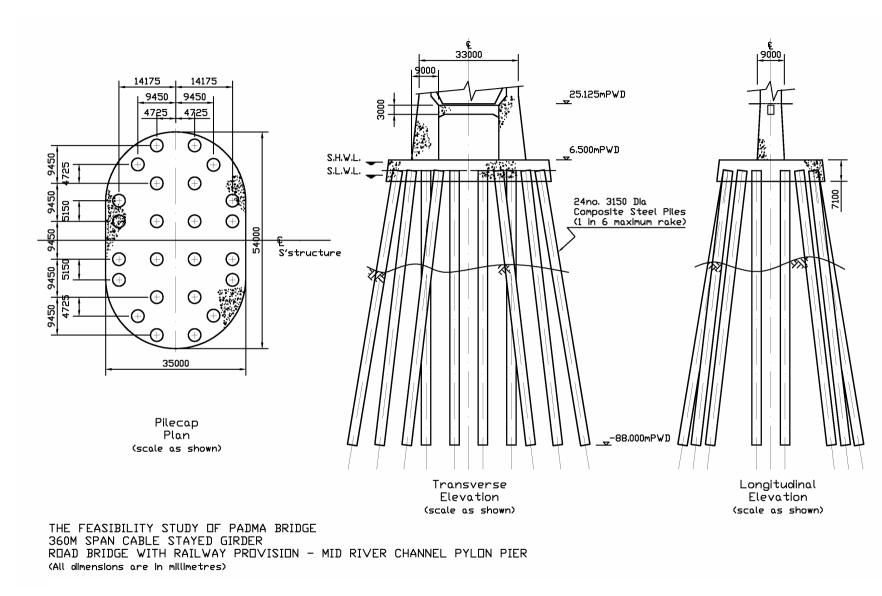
Mid-River Pylon Substructure General Arrangement (Alternative-HR2)
